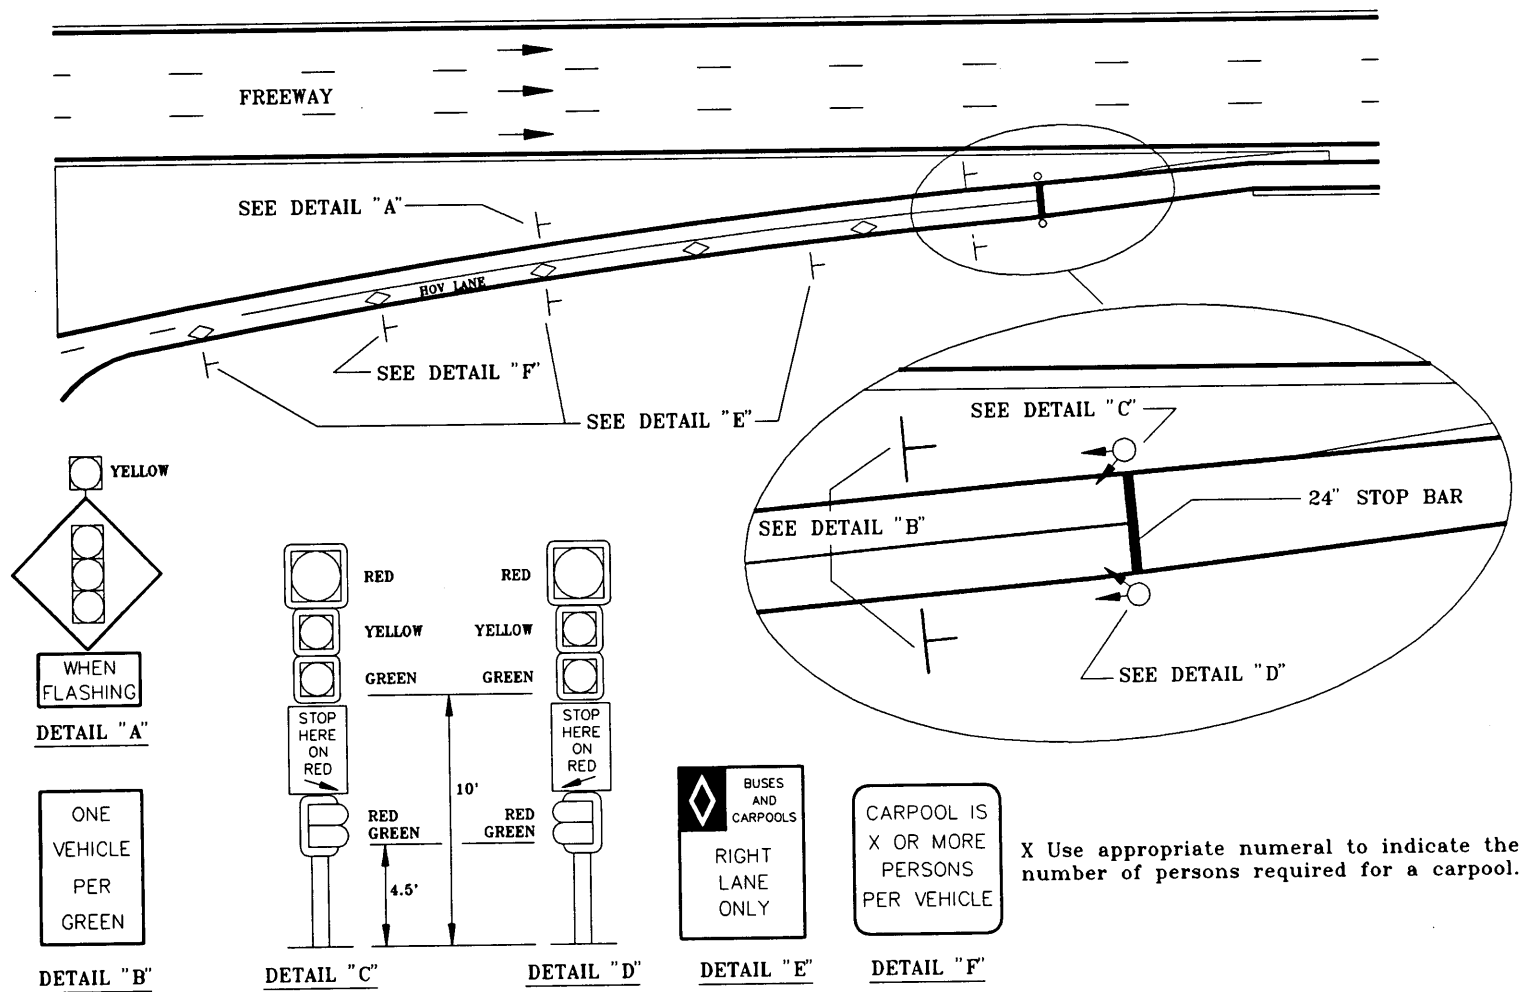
Typical ramp meter and HOV bypass lane installation (2).
